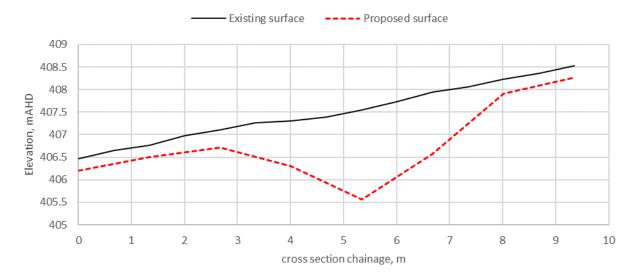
Example cross section of the Station Road existing surface and proposed channel profile
